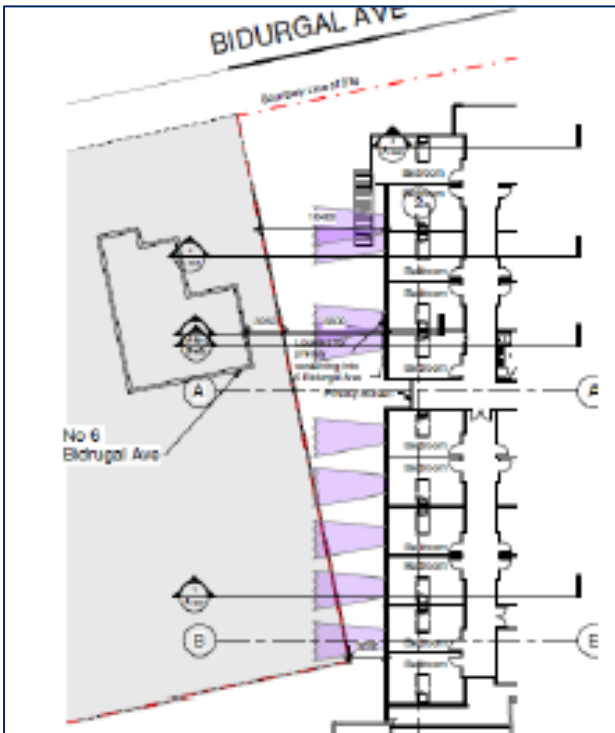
| Overlooking 6 Bidurgal Avenue (Source: EIS 2020)
